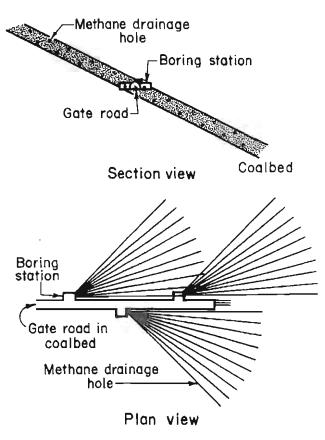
Schematic plan and section view of methane drainage holes drilled from gate roads driven along strike in coalbed to outline longwall panels, Japan (Modified from Ohga and Higuchi, 1987).
